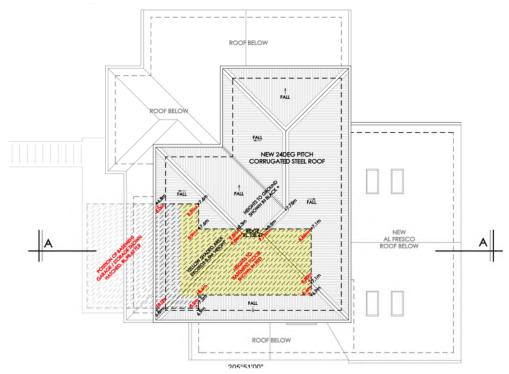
Roof plan showing building height notations (maximum 8.3m from ground level, maximum 9.86m when measured from basement floor level)
